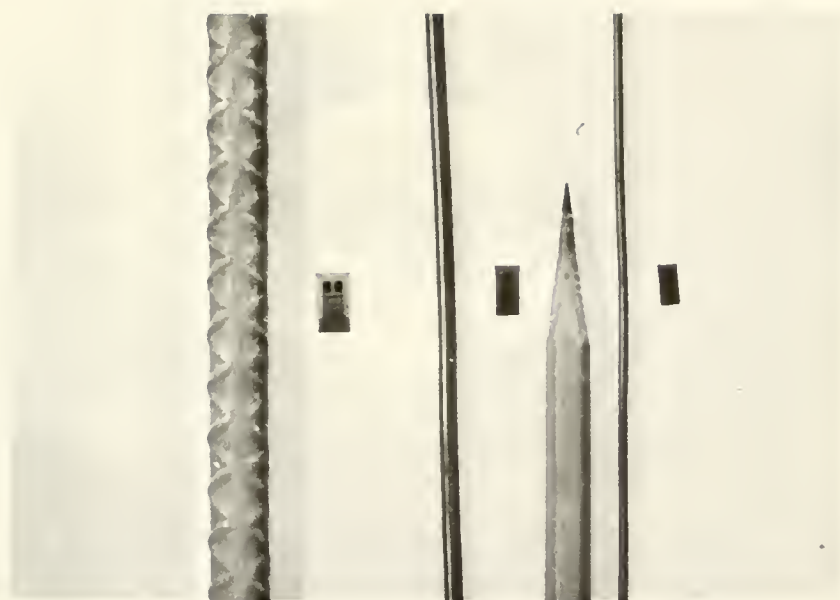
Typical Reinforcing Steel and Strain Gages Used.
